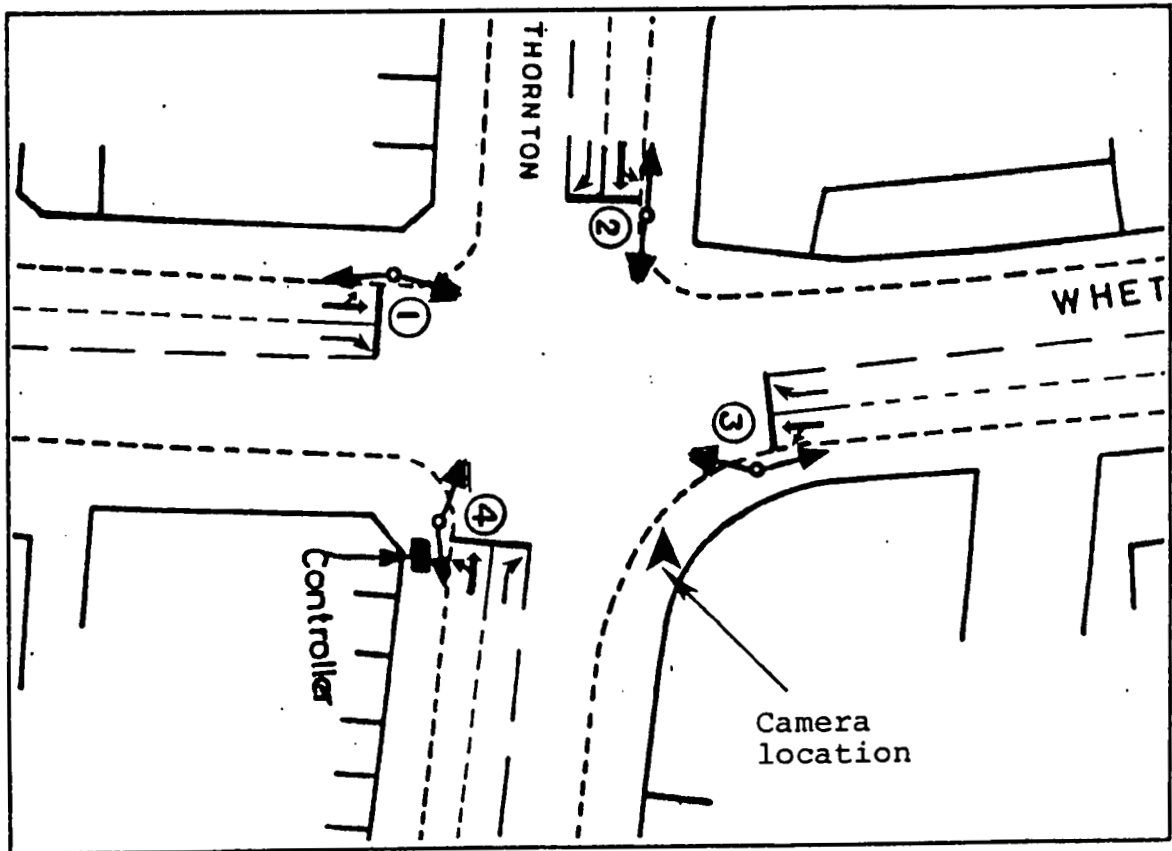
Site "1" junction layouts, camera location and traffic movements (Bradford).
